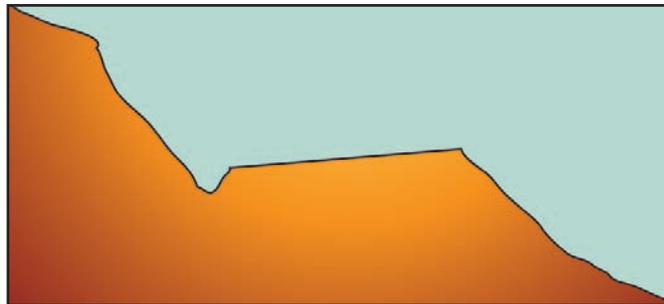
An insloped road surface shape concentrates runoff against the backslope or inside ditch.
